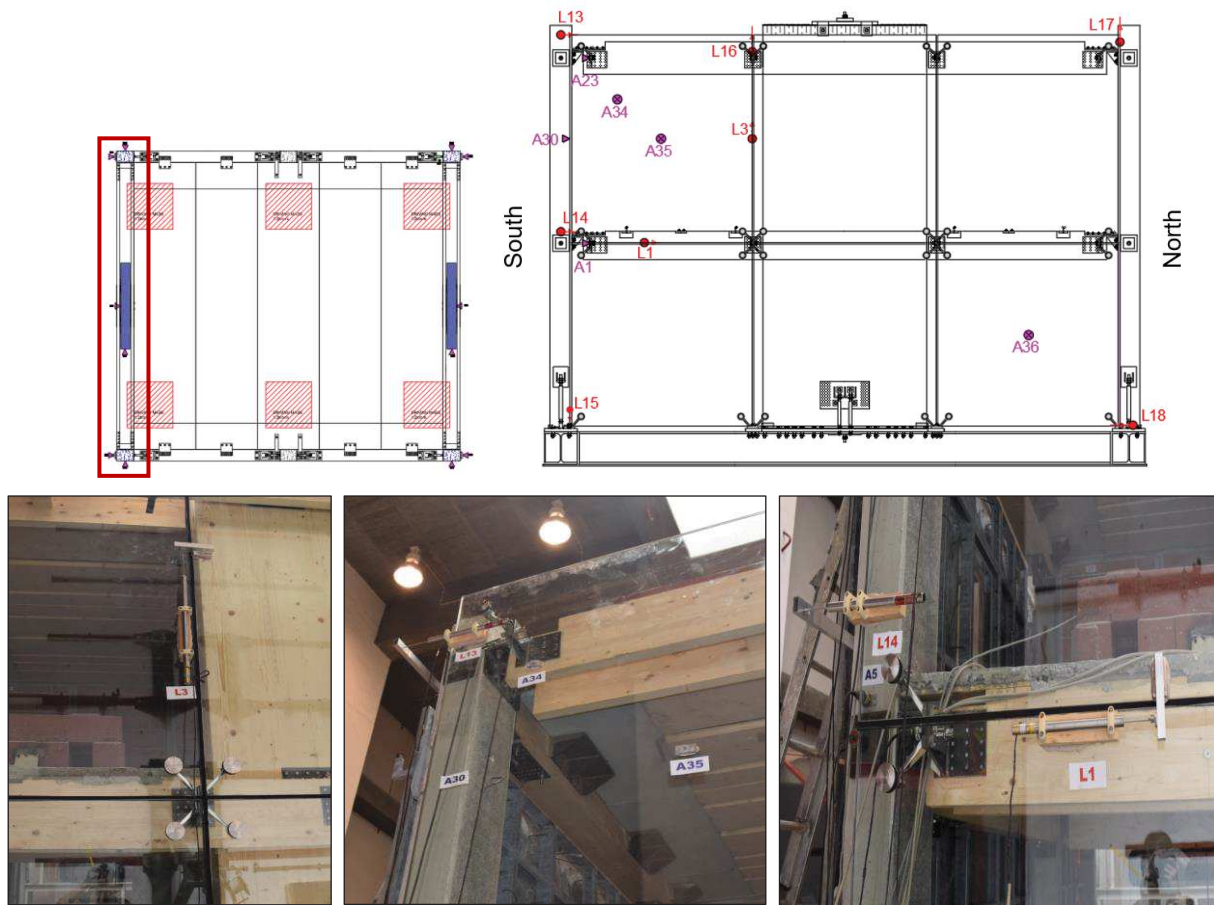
Instrumentation plan for the glass façade in the East side: schematic drawing (top) and photos (bottom).
